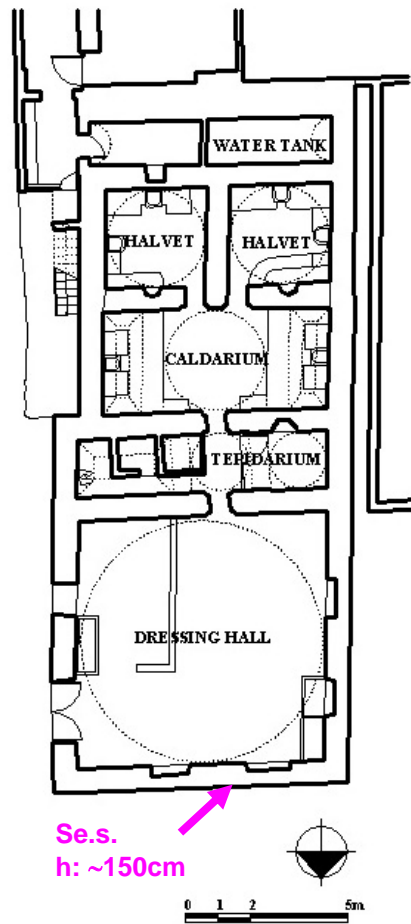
Plan of the Seferihisar Bath, showing where stone masonry mortar samples (Se.s.) were collected.
